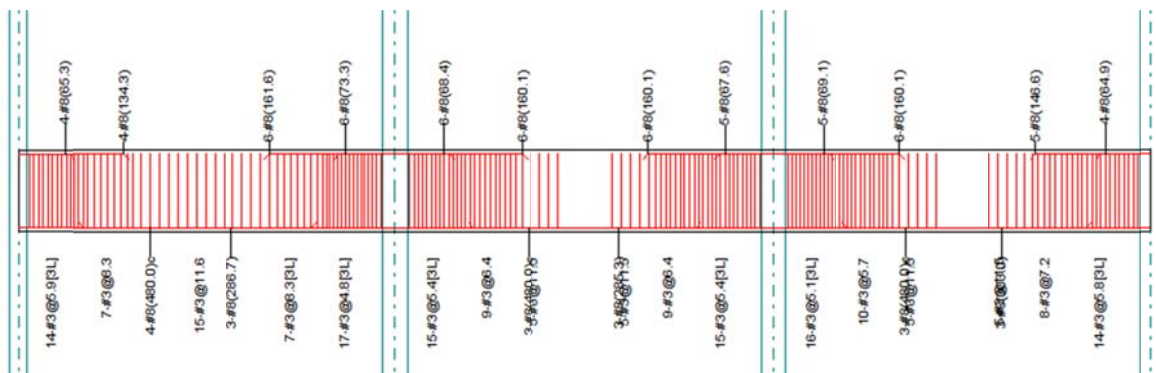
spBeam Column Line H Reinforcing Diagram (Lateral Loads)
